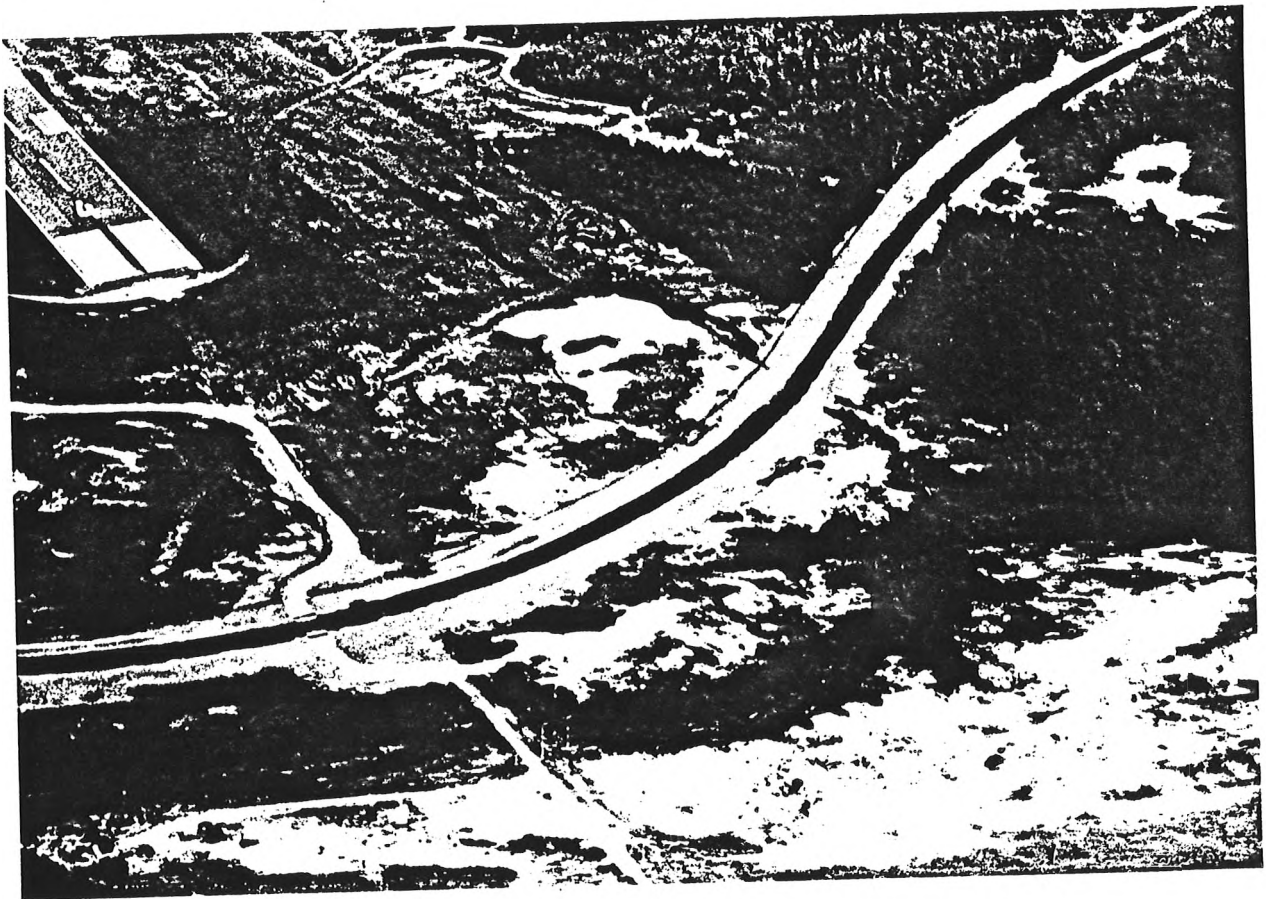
The Michaud site vicinity following road construction, August 1986. Photo: Spiess, elevation 800 feet.
